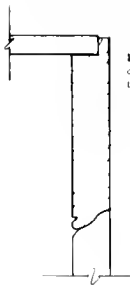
Wall Section This section shows how the feather board is rabbeted behind the flat cornice board. The top of the cornice board is notched to support plaster.
